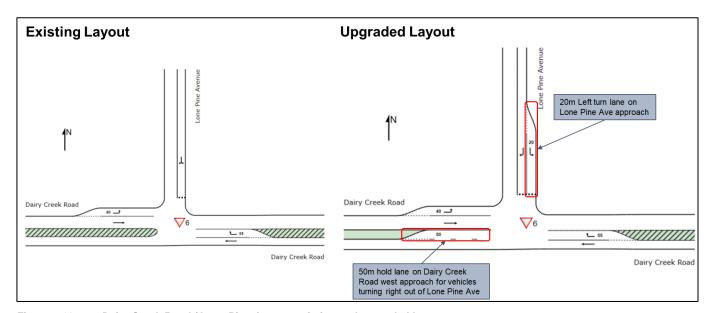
Dairy Creek Road / Lone Pine Avenue existing and upgraded layouts
